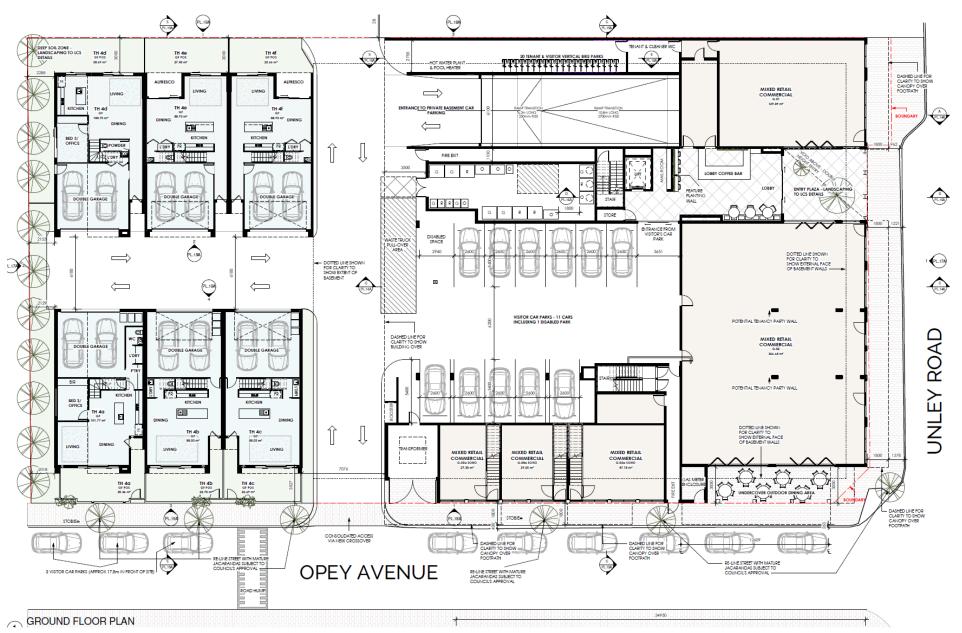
Ground floor plan for proposed development at 248 Unley Rd, Hyde Park. NTS
